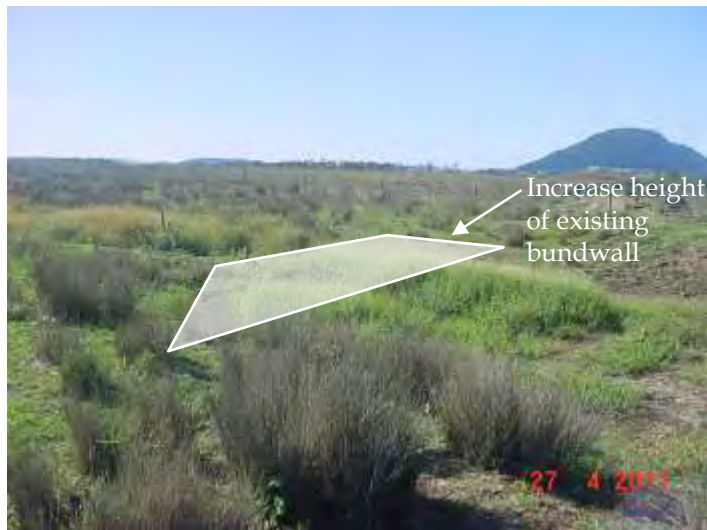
Site 11 - Cut-off Channel Showing Possible Location of Bundwall
